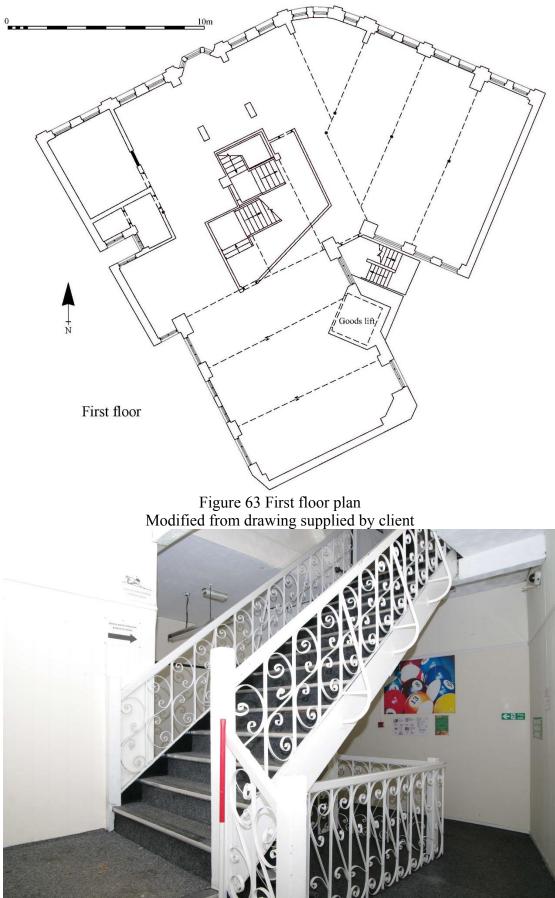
First floor landing and main stairs Looking north-east. 1m scale. Stairs to 2nd floor on left
